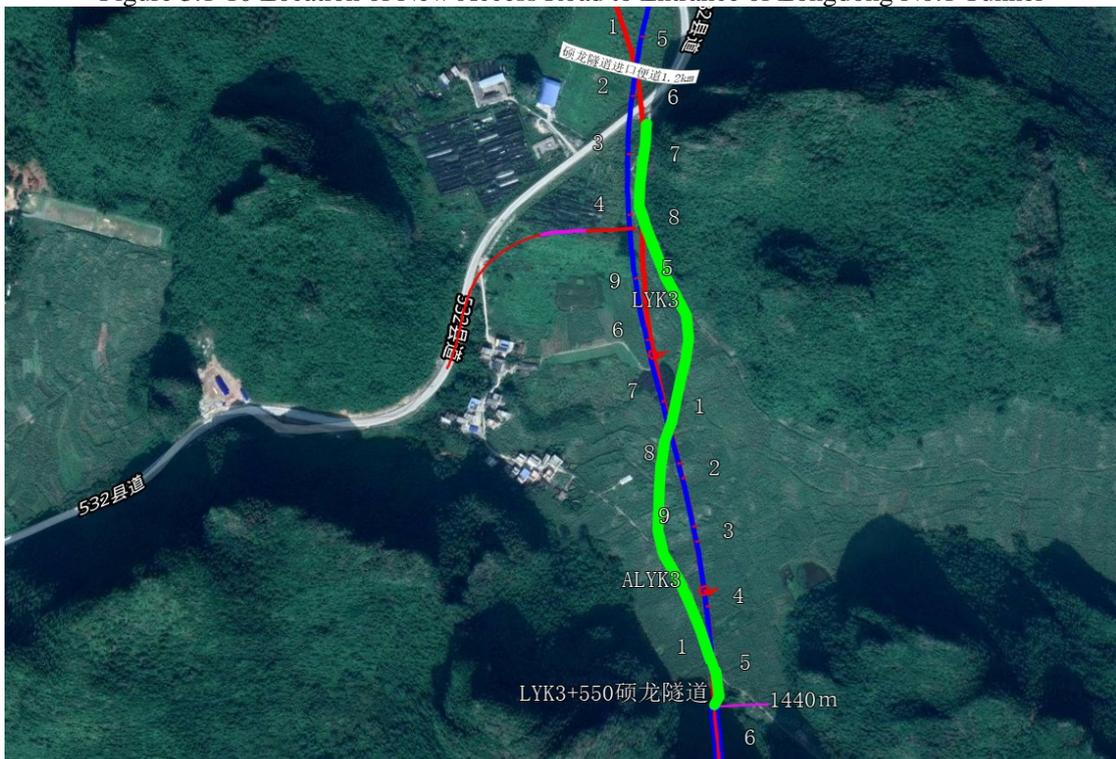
Location of New Access Road to Entrance of Shuolong Tunnel
